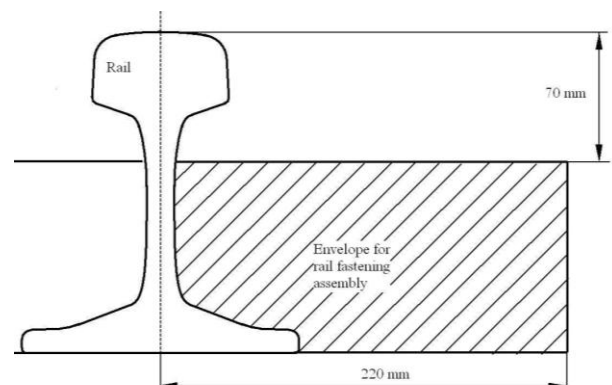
Envelope for rail fastening systems (which act on the rail foot) for concrete sleepers in ballasted track
